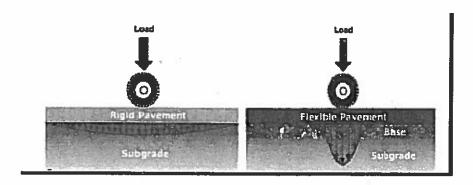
Typical Stress Distribution Under a Rigid and Flexible Pavement (1/)
